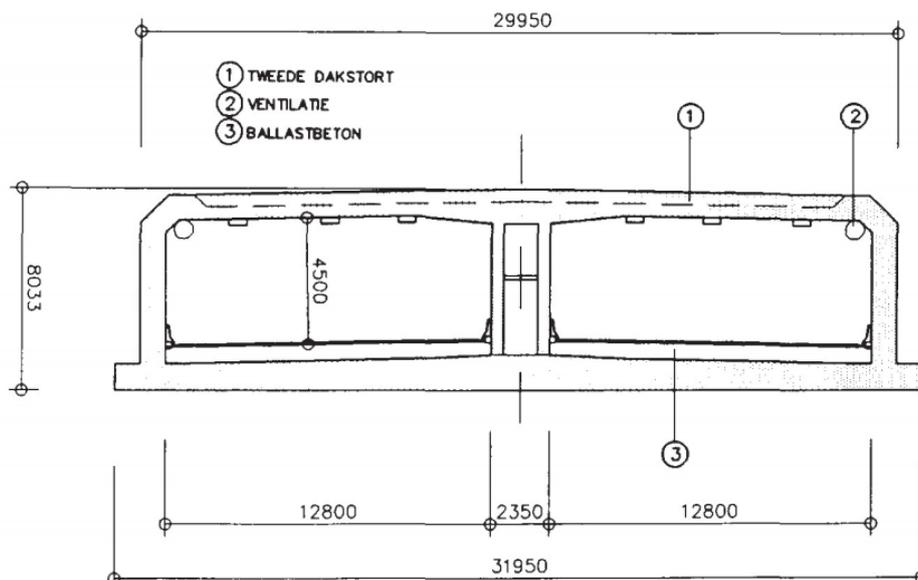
Cross-section of the Noordtunnel (tunnel engineering consultants, 1991)
